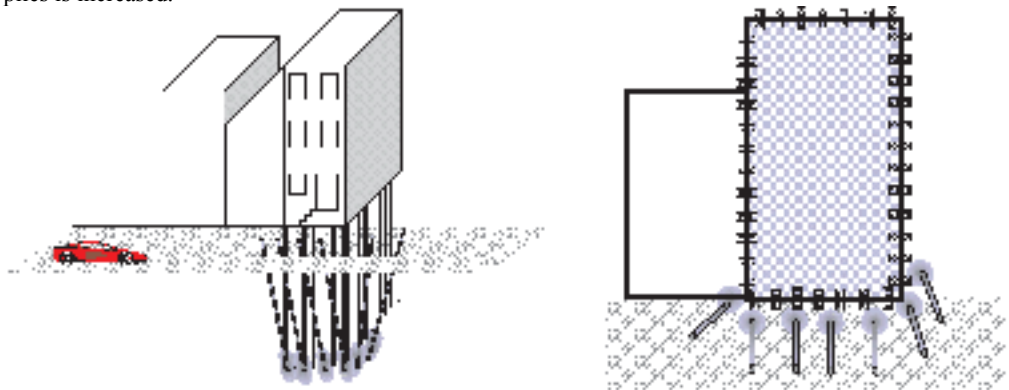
Example of Compaction Grouting near a Pile Foundation
